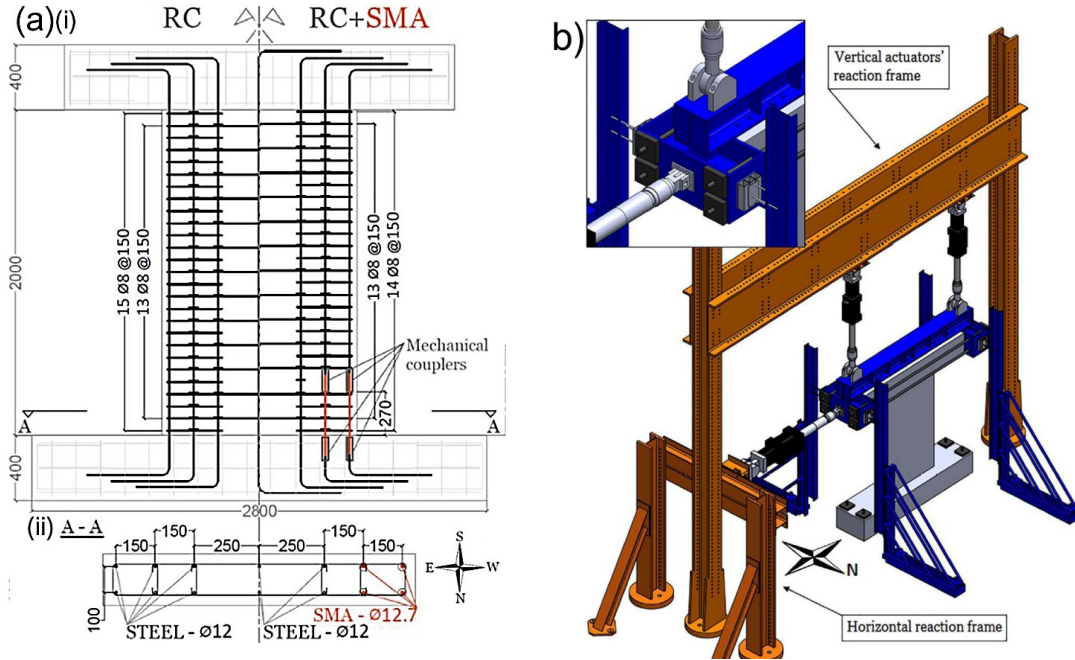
(a) Geometry and reinforcement layout of test units RC and RC+SMA specimens, including close-up of the cross-section (b) 3D sketch of the setup assembled at the technological platform LEMSC for the test of the two walls
